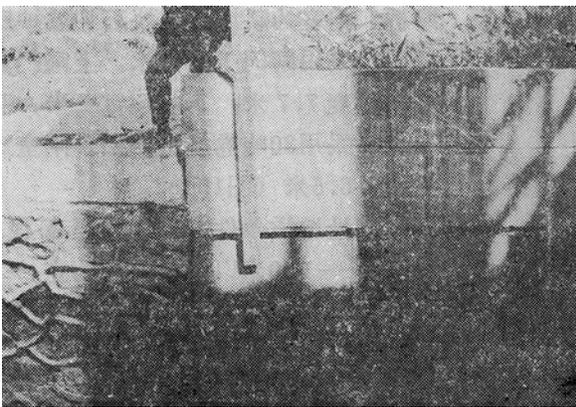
The Π frame column of the lock pier cracked at the Yonghe Shiplock.
